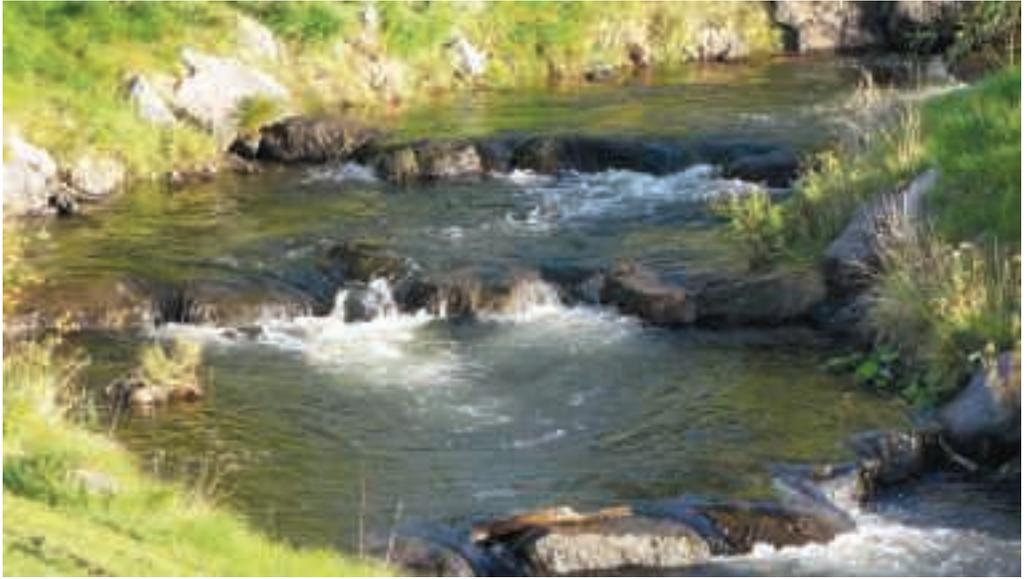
Example of bypass channel of rock-ramp fishway – in detail (Obermaubach, the Rur River, Germany, photo: M. Drahoňovský).
